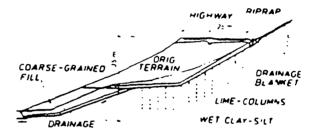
Slope Stabilization Using Lime Columns and Drainage
